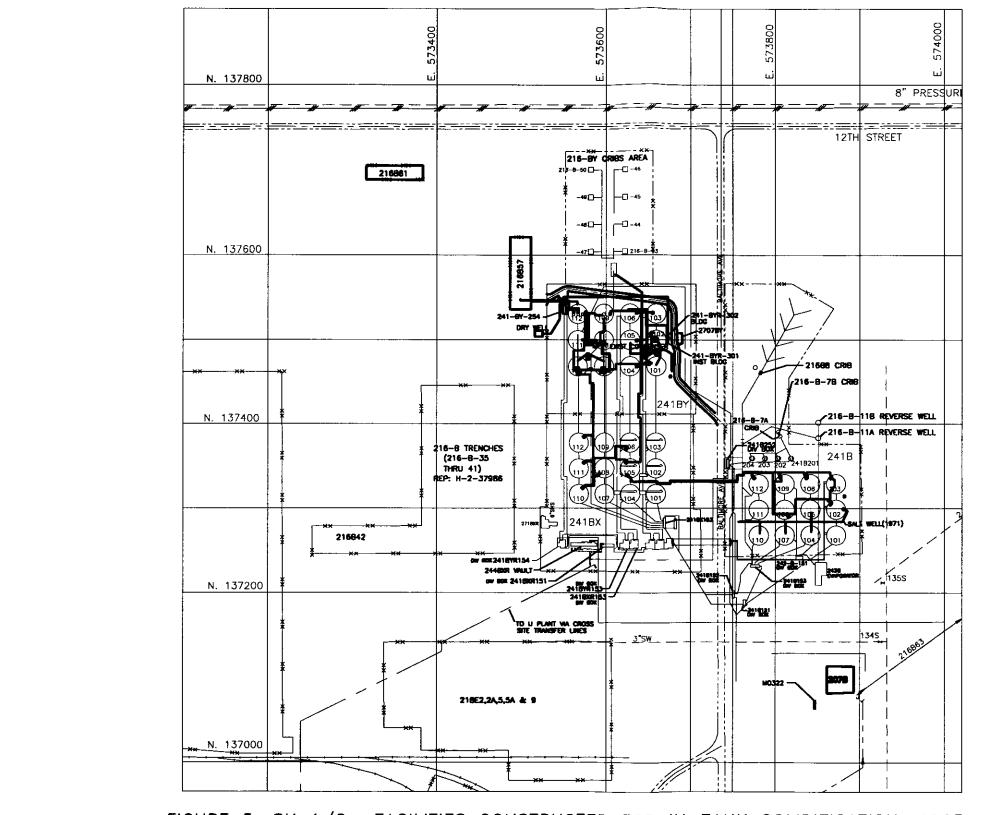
, SH 1/2 FACILITIES CONSTRUCTED FOR IN-TANK SOLIDIFICATION, 1965-1975
